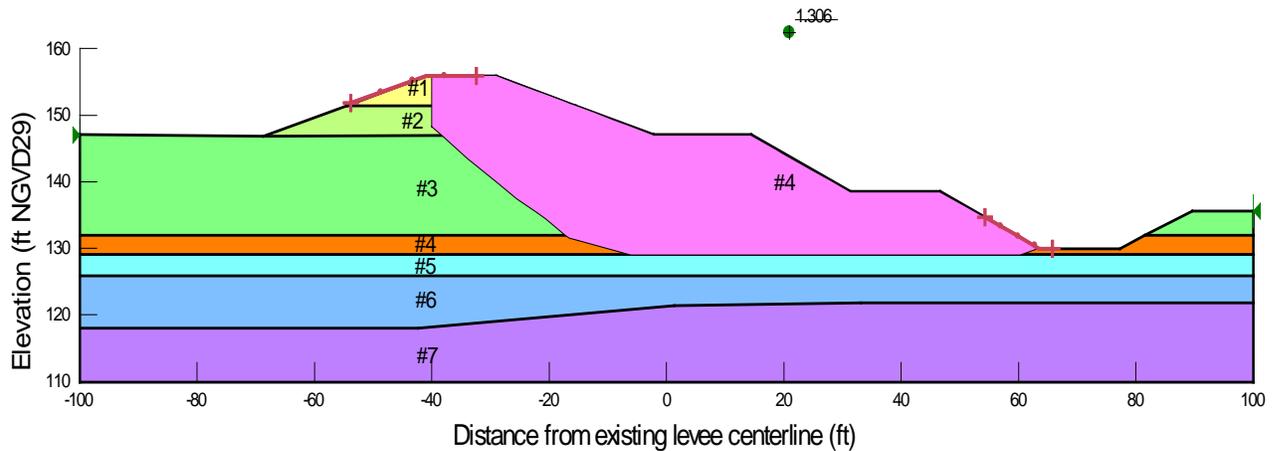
Thirty-Five-Foot Levee Setback with Excavated 1V:2H Bank Slopes And Berm, End-Of-Construction Condition
